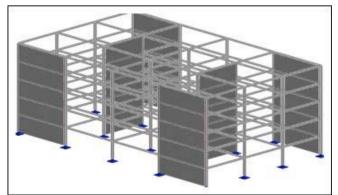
Shear walls as Load Transfer Mechanism (Url 3).
